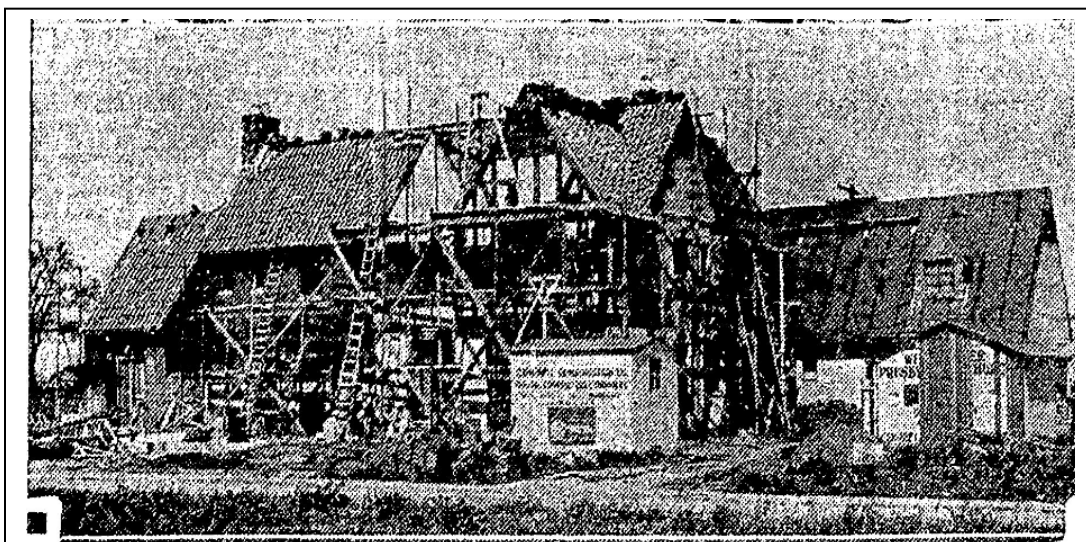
1957 13<sup>th</sup> Avenue under construction. Source: *Sacramento Bee*, April 21, 1928.
